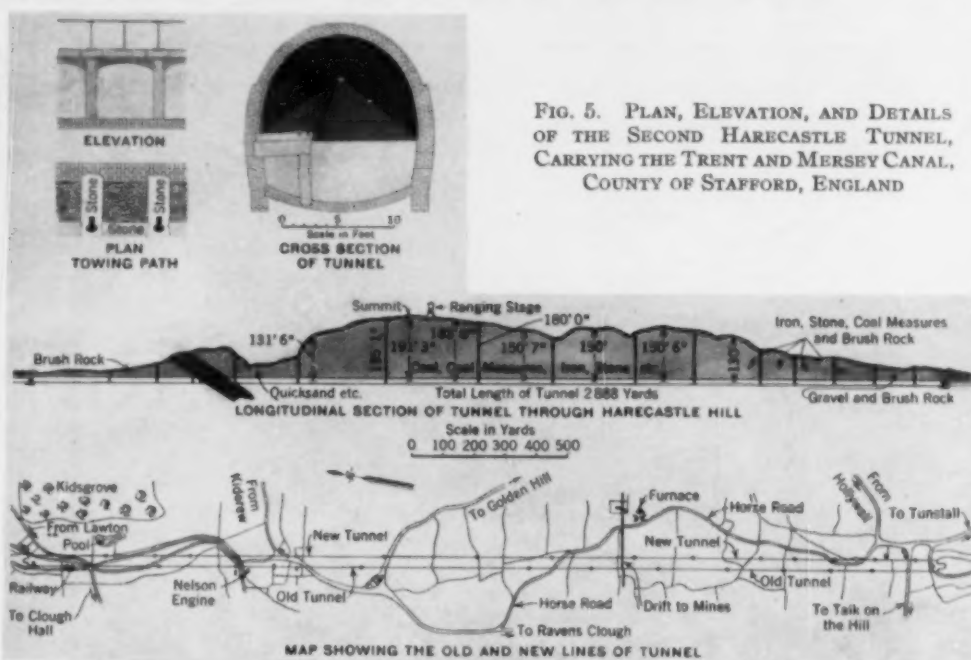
PLAN, ELEVATION, AND DETAILS OF THE SECOND HARECASTLE TUNNEL, CARRYING THE TRENT AND MERSEY CANAL, COUNTY OF STAFFORD, ENGLAND
